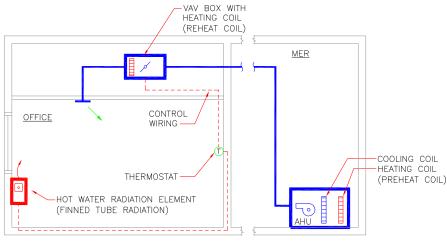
Typical Perimeter Zone Heat Arrangement
